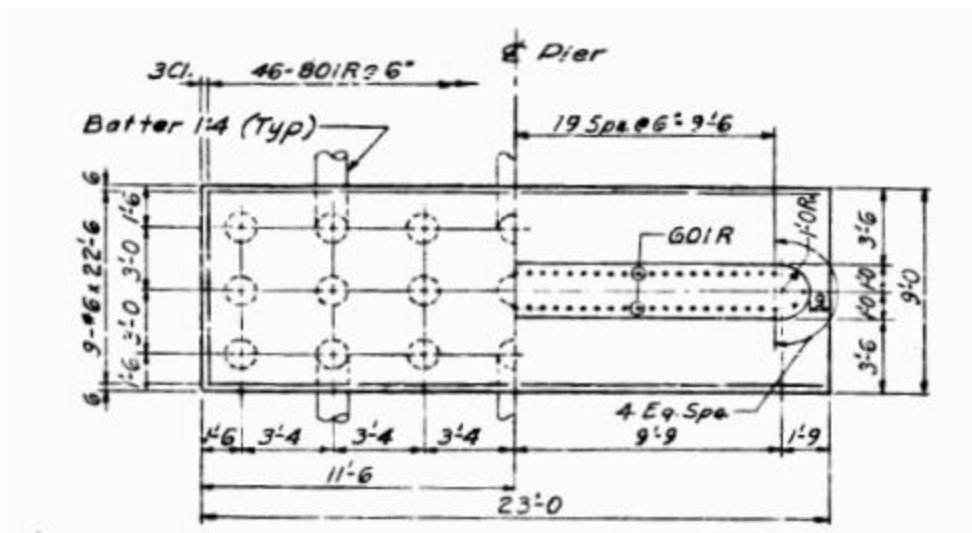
System C: Cross Section of Pier 13 of the Bridge (NBI 33240) (1986)
